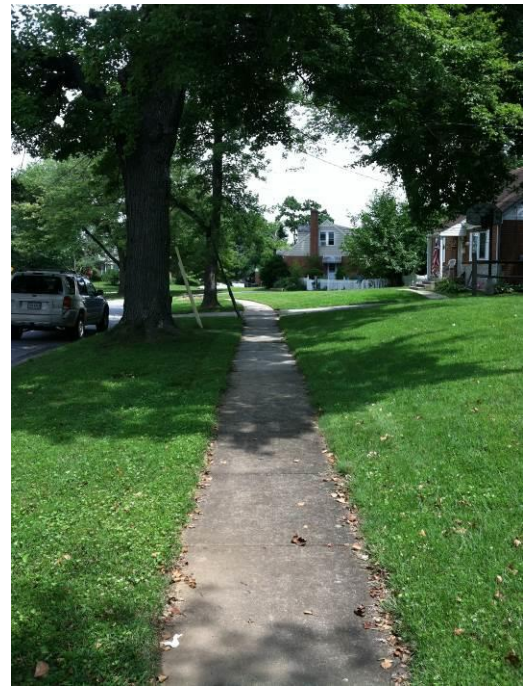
Existing Sidewalks South Side Landgreen Street, View East
